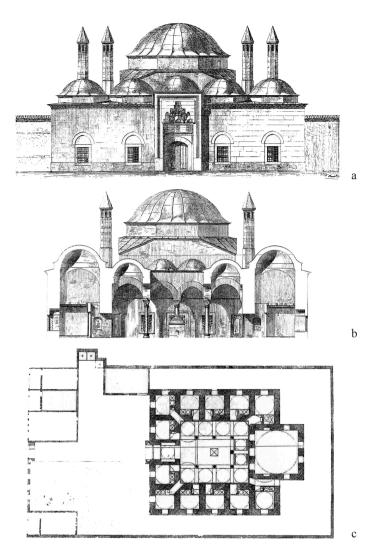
a–c: Kuršumlija Medresa, Sarajevo, 1537. Engravings published by Stix in 1887: a: elevation, b: section, c: ground floor plan.
